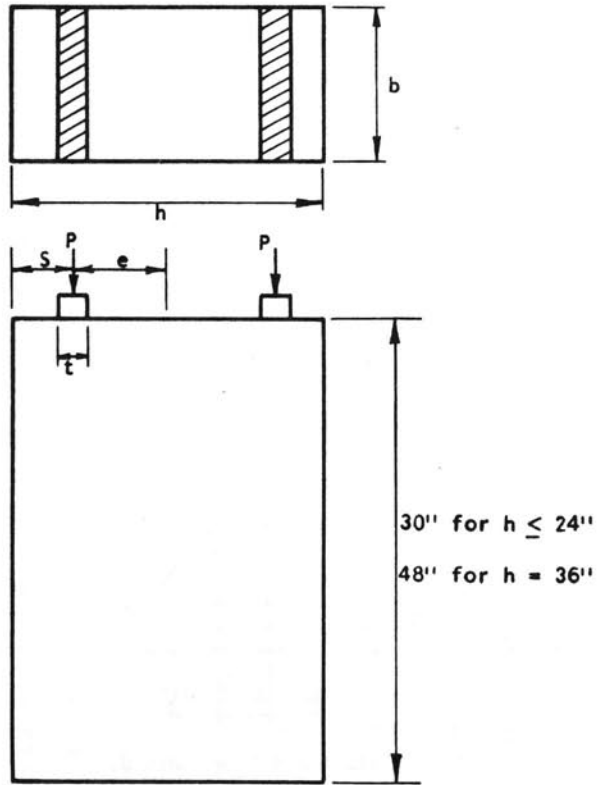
CROSS-SECTIONAL DIMENSIONS FOR CONCRETE COLUMN HEADS
